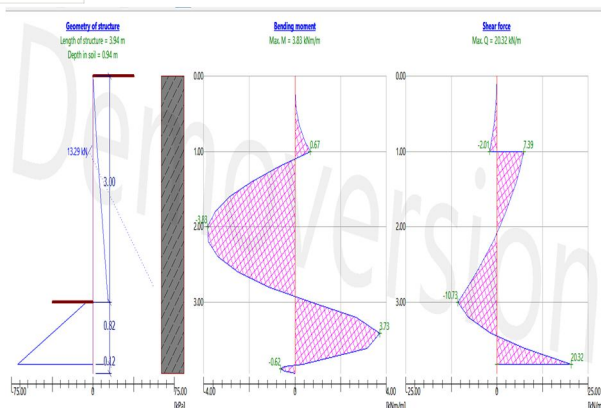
Effect of Anchor on 3.0m RCC Sheet Pile Wall (M20 & FE500)
